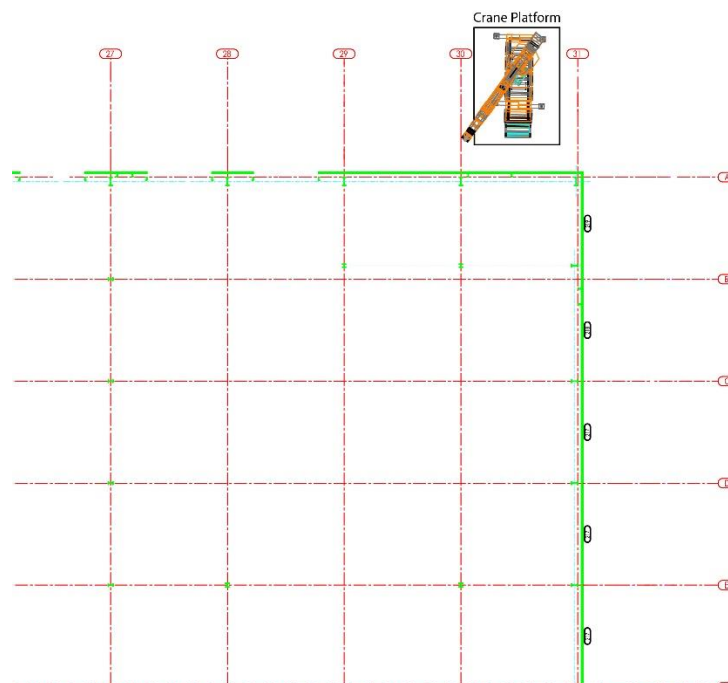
The initial plan of the crane platform to erect the second side of the building
